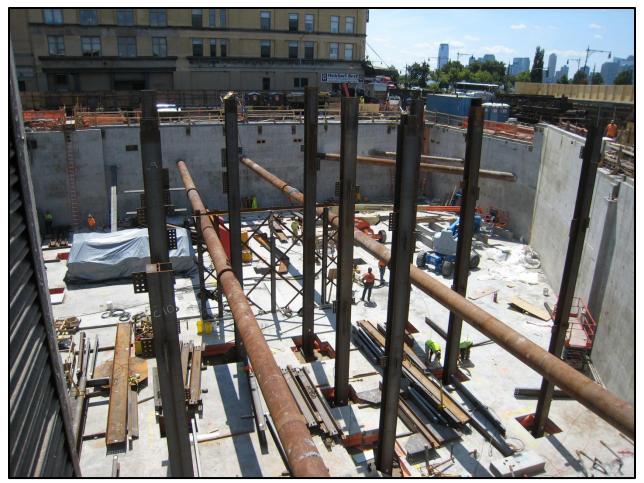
Photo of cross lot bracing located on the west side of the site looking south. Photo taken by Vincent Rossi
